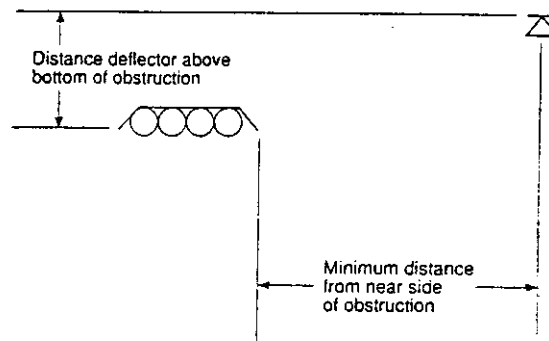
Position of sprinklers in relation to obstructions located entirely below the sprinklers. (To be used with Table 4-4.3.4.2.1.)
